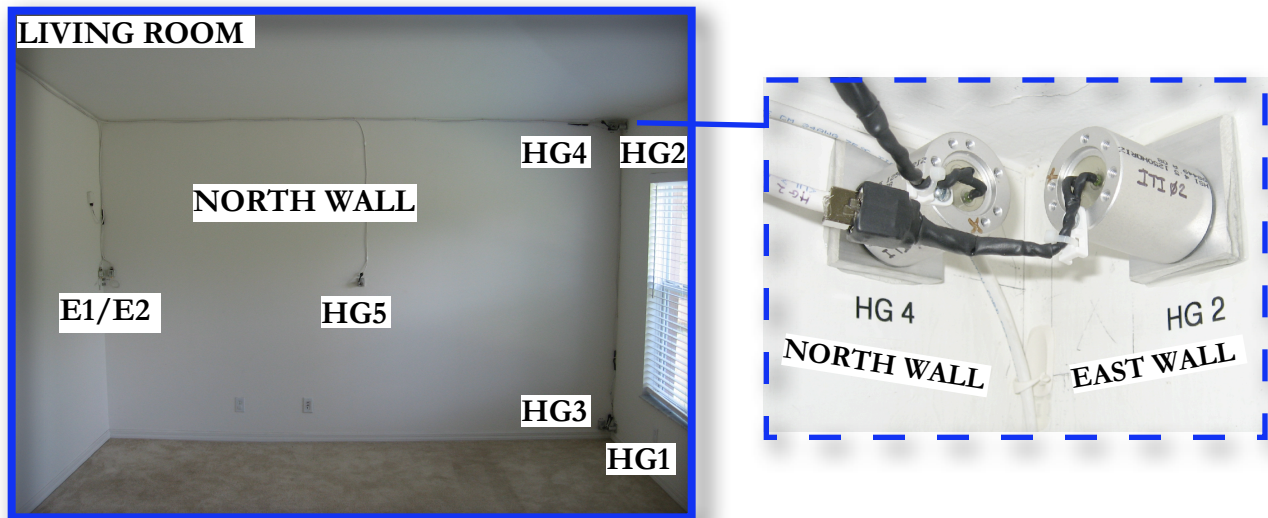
Figure X - Instrumentation of north wall of living room: 5 horizontal velocity transducers to measure velocity of the superstructure (HG3,4 North-South, HG1,2 East-West) and the wall response (HG5 North-South).
